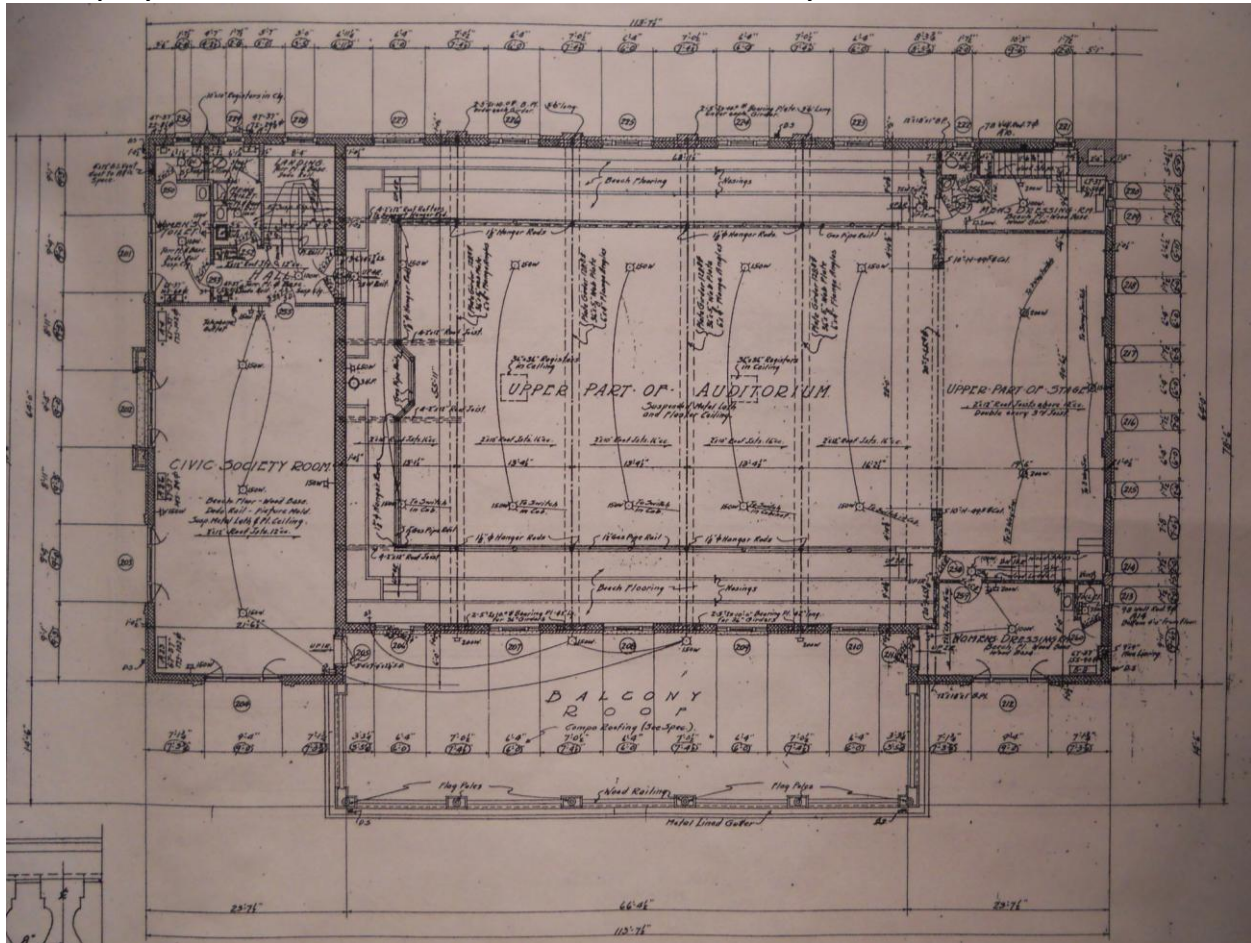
2nd Floor plan, Memorial Building, 1928.
